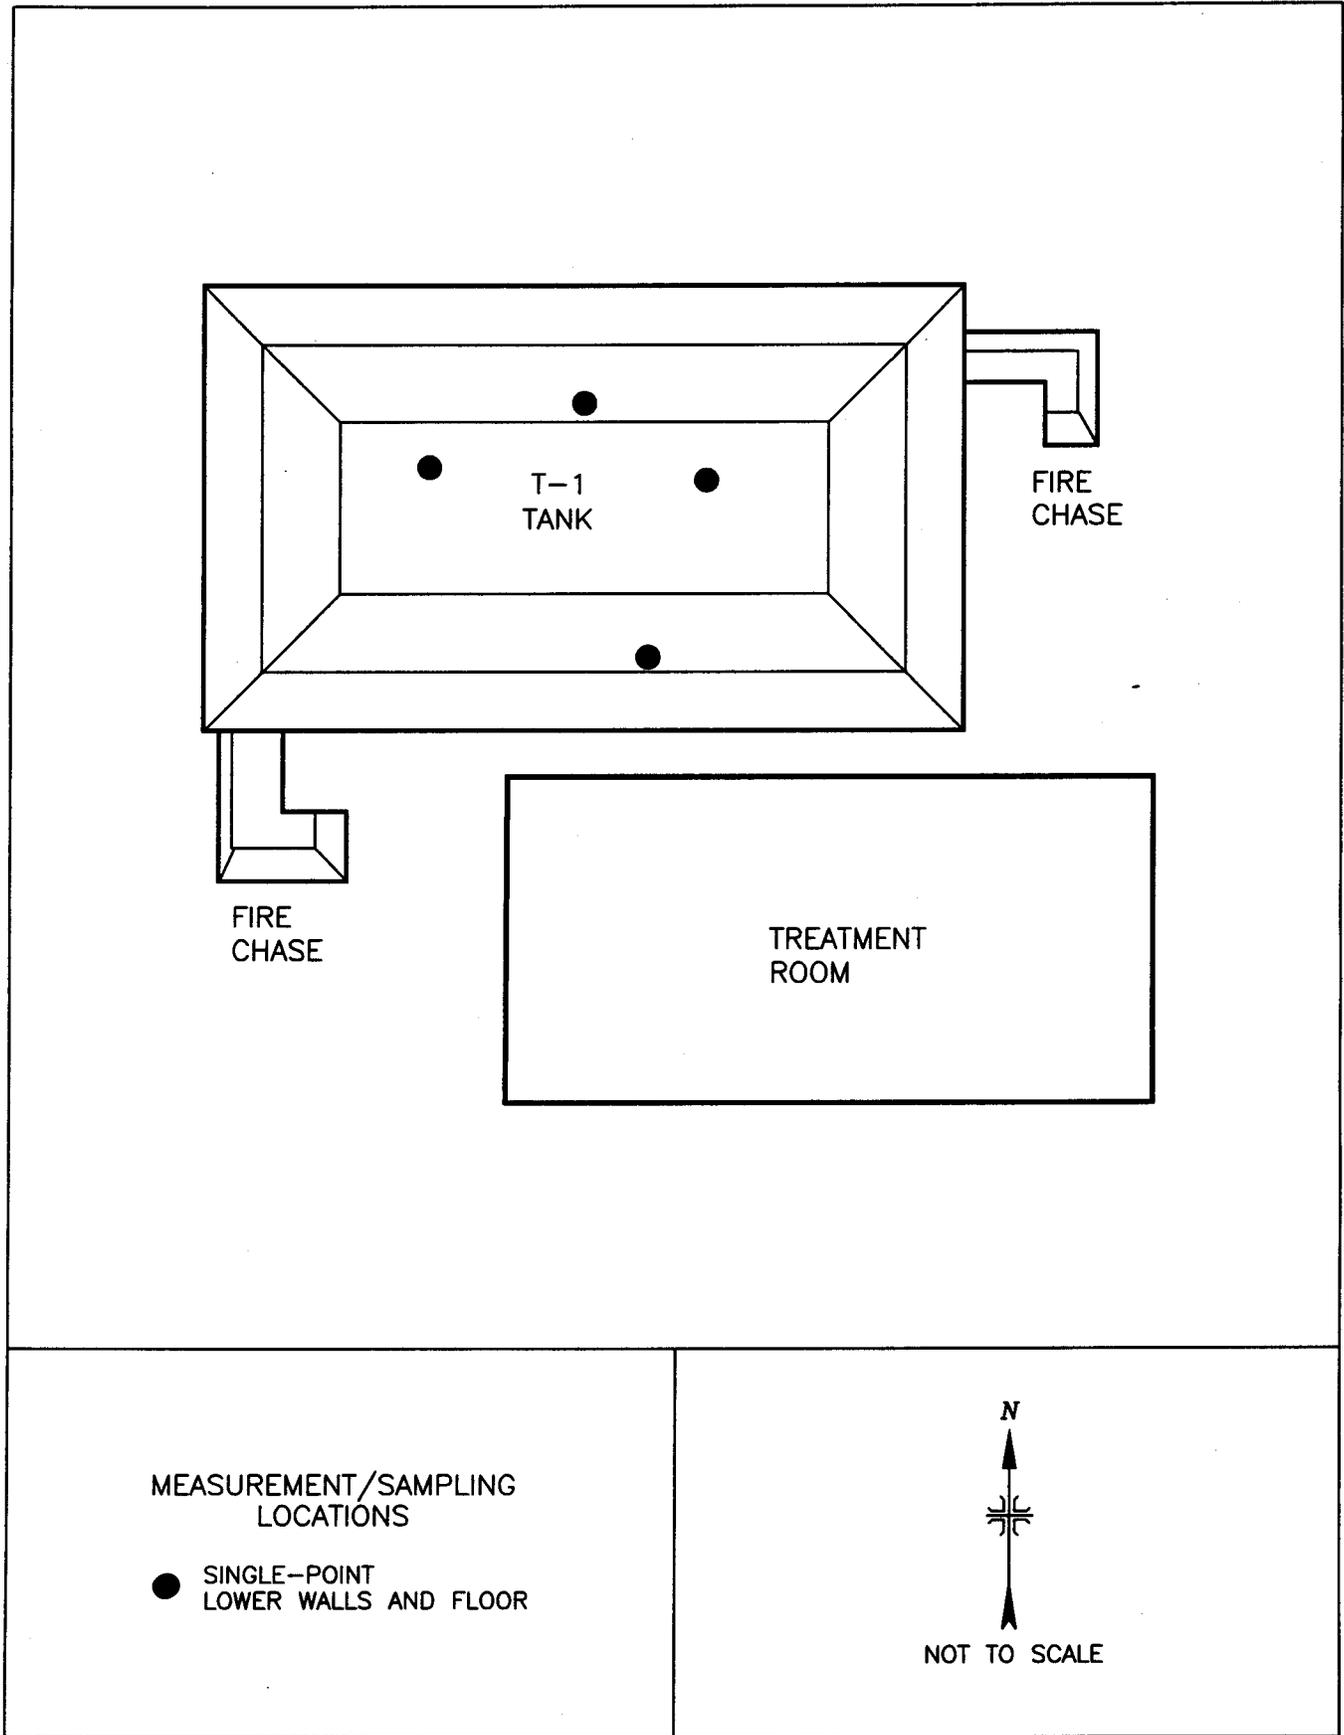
Building 4133, T-1 Tank – Measurement and Sampling Locations
